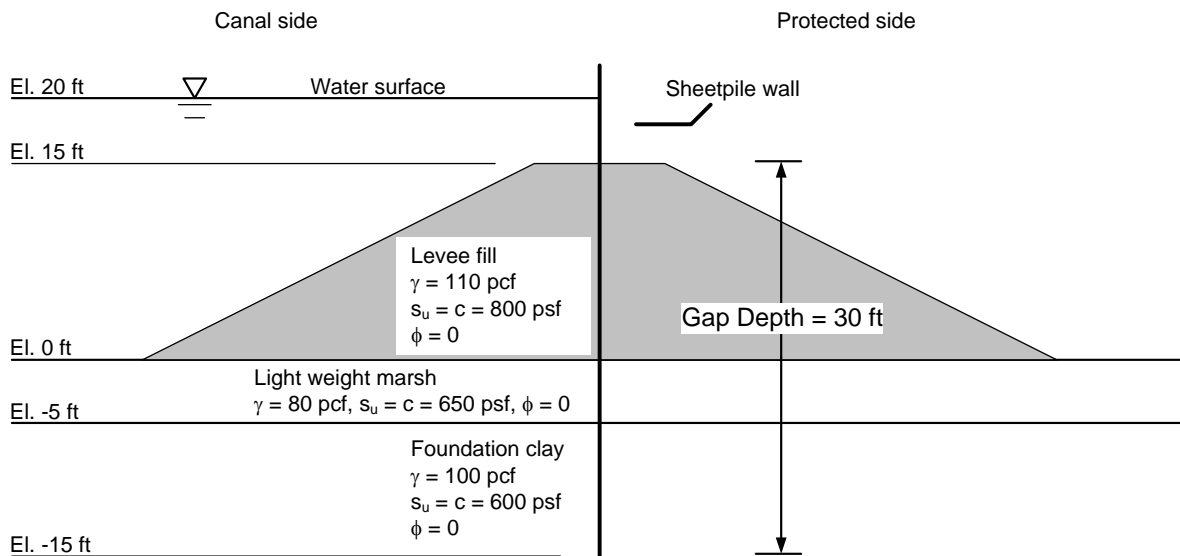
I-wall in layered cohesive soils (note: to convert feet to meters, multiply by 0.3048; to convert pounds (mass) per cubic foot to kilograms per cubic meter, multiply by 16.02; to convert pounds (force) per square foot to kilopascals, multiply by 0.04788)
